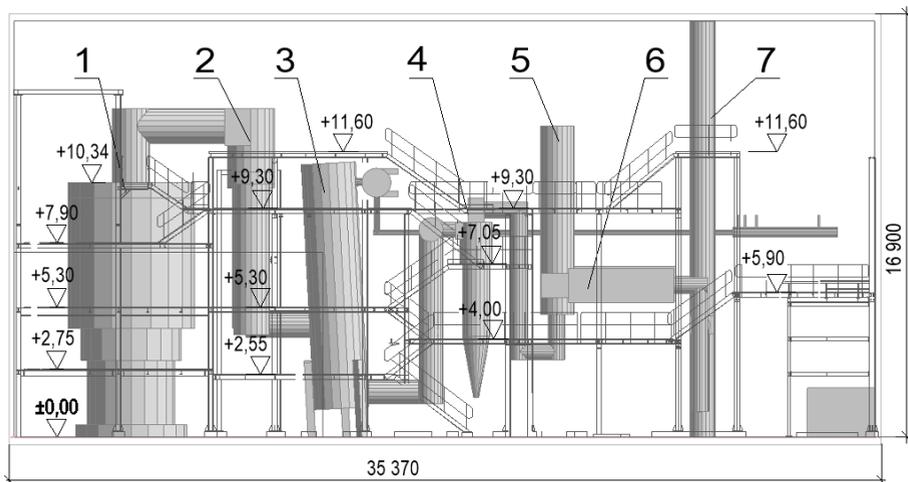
Location of technological equipment in the boiler room, where: 1 – fluidized-bed furnace, 2 – recuperator, 3 – boiler, 4 – multicyclone, 5 – flue gas cooling device, 6 – bag filter, 7 – stack.
